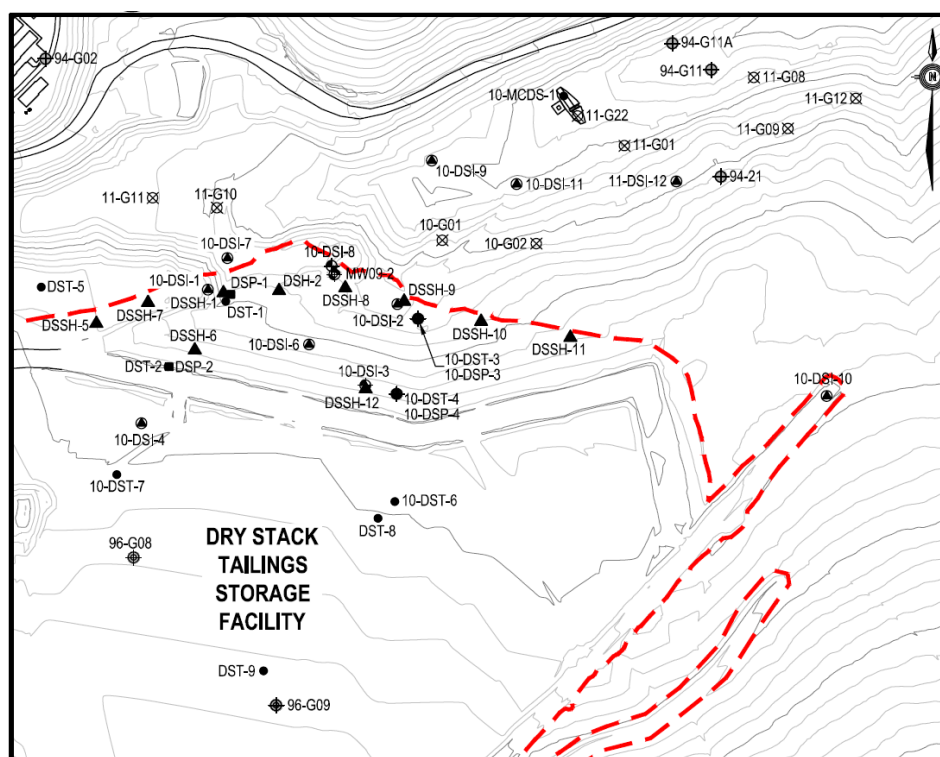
Dry Stack Tailings Storage Facility monitoring instruments
